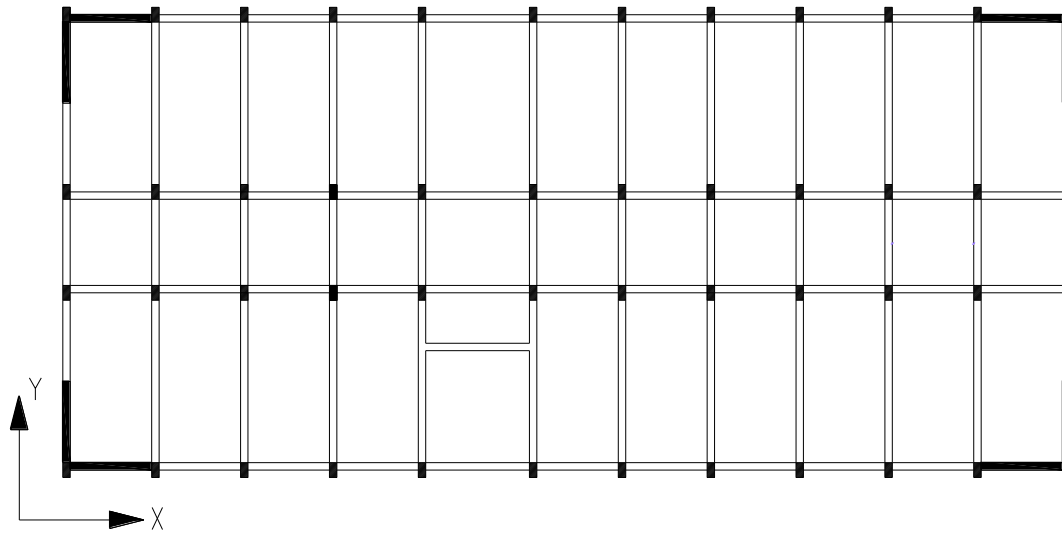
Plan View of the Designed Building with 0.5%-0.5% Shear Wall Ratio
